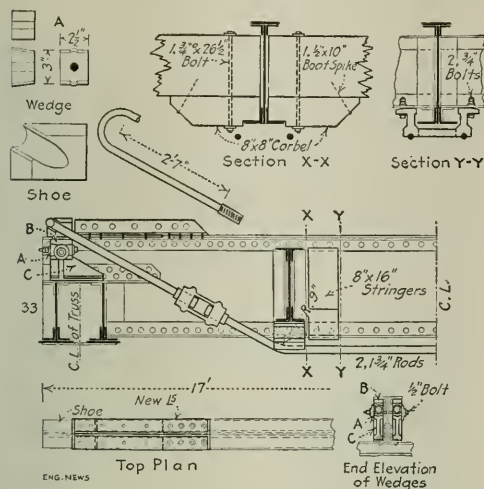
REINFORCEMENT OF FLOOR-BEAMS BY TRUSS RODS; WINONA BRIDGE, C. & N. W. Ry.
